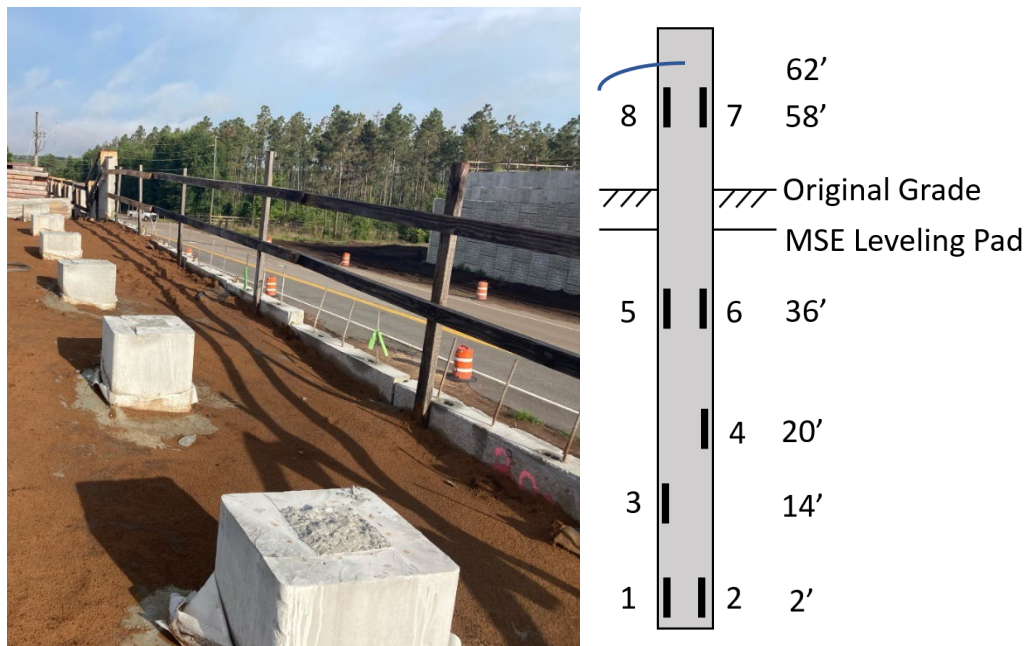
Sandridge Road pile cutoff (left) and gauge designation and elevations (right)
